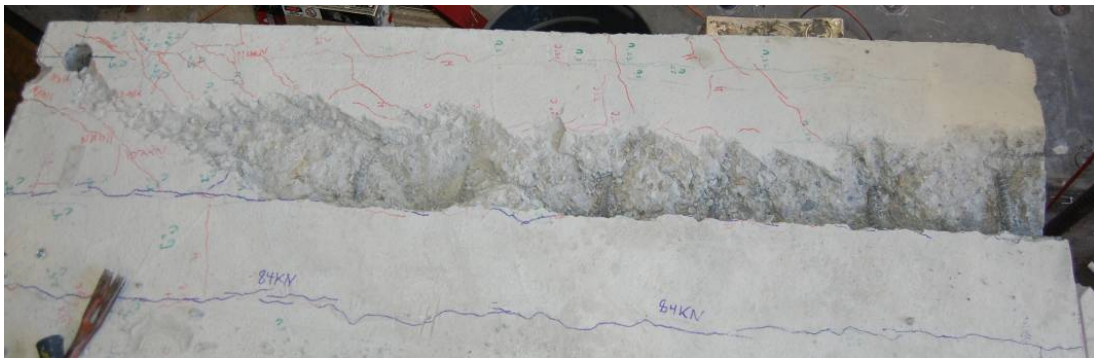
Detail of cracking observed at ultimate capacity- top view of as-built deck
